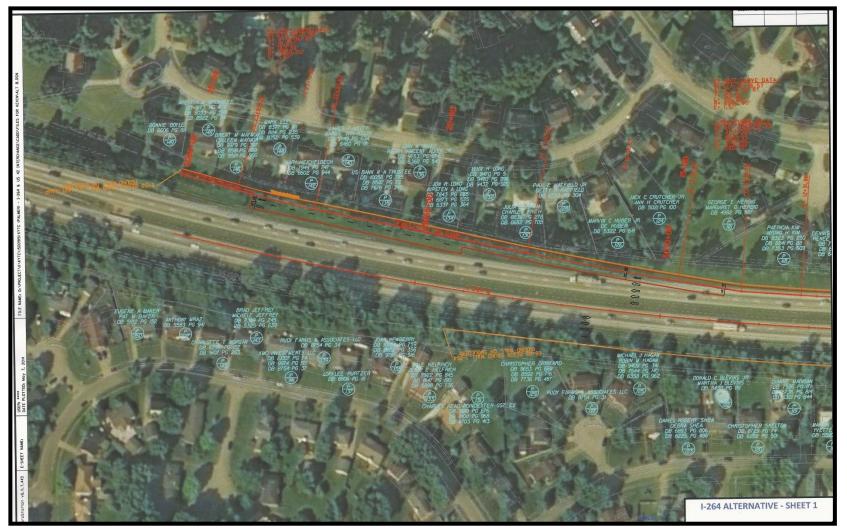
Alternative B: Preferred I-264 Widening Alternative – Sheet 1 (DRAFT)
